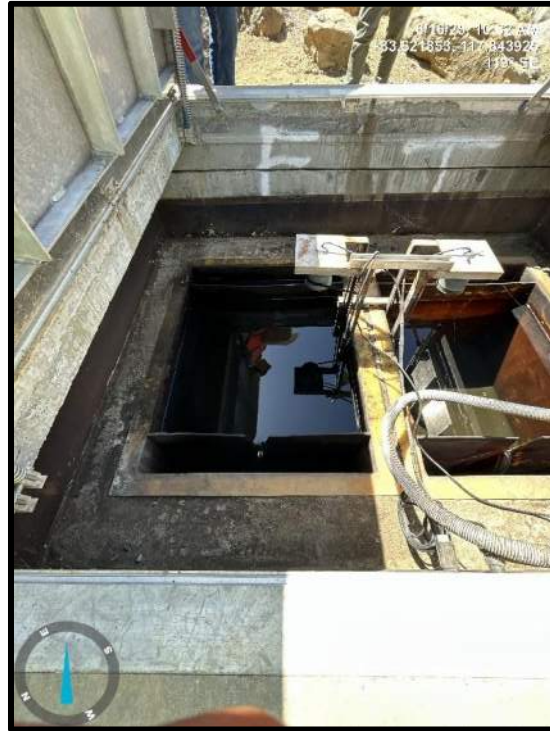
D/S Toe and Floor Drain V-notch weirs.
